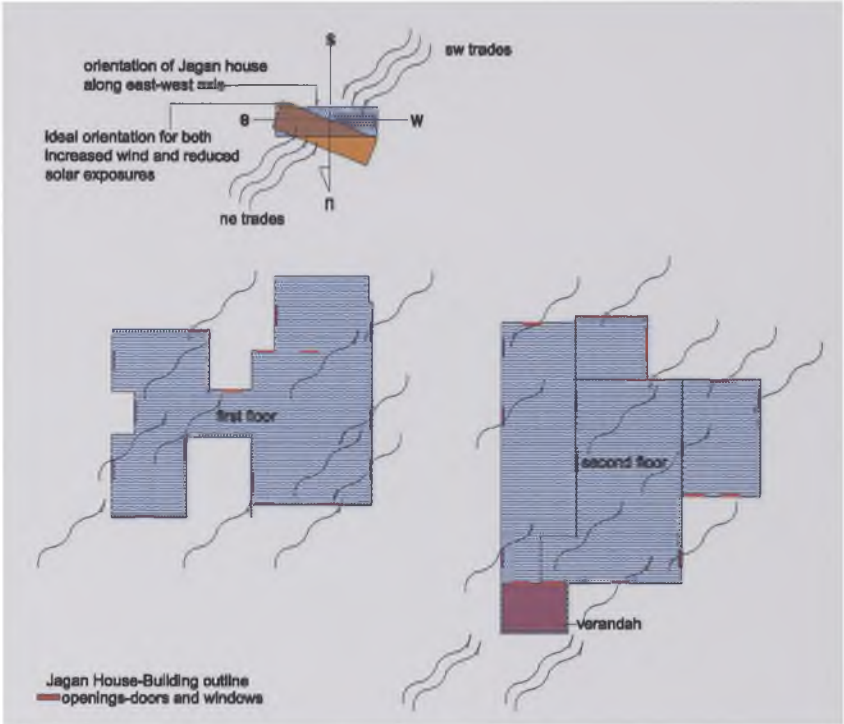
Analytical Orientation Diagram--Jagan House. Window openings permit cross-ventilation.
